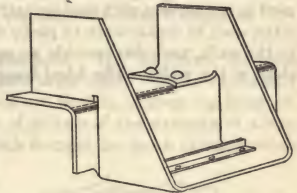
Duplex Steel Wall-hanger for Large Beams
